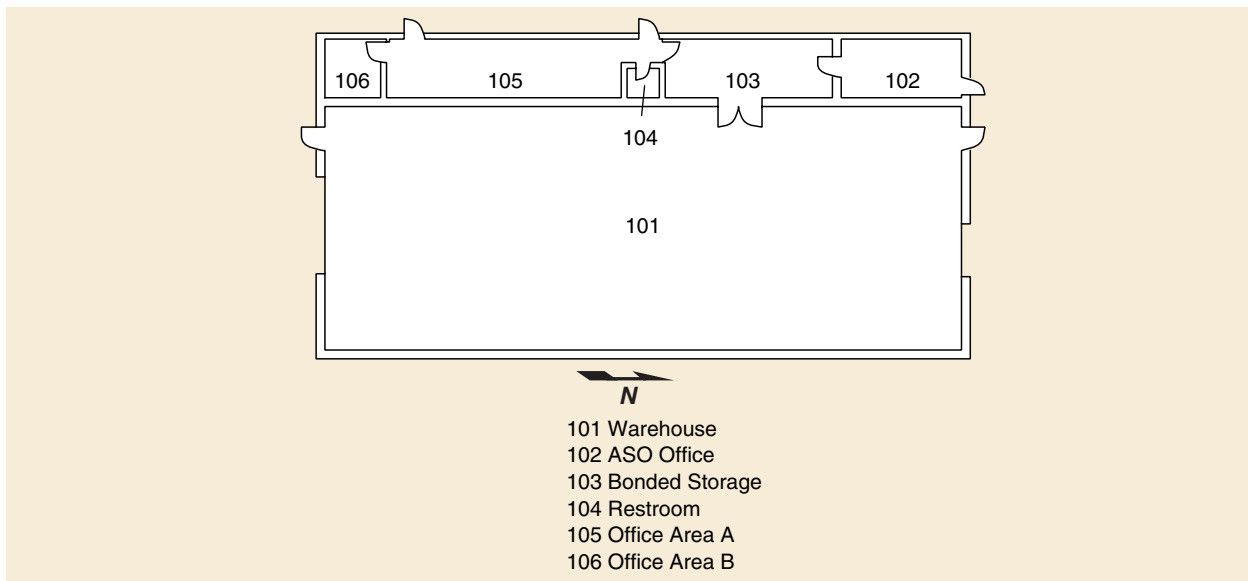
Building 4 Detailed Floor Plan, Astrotech
